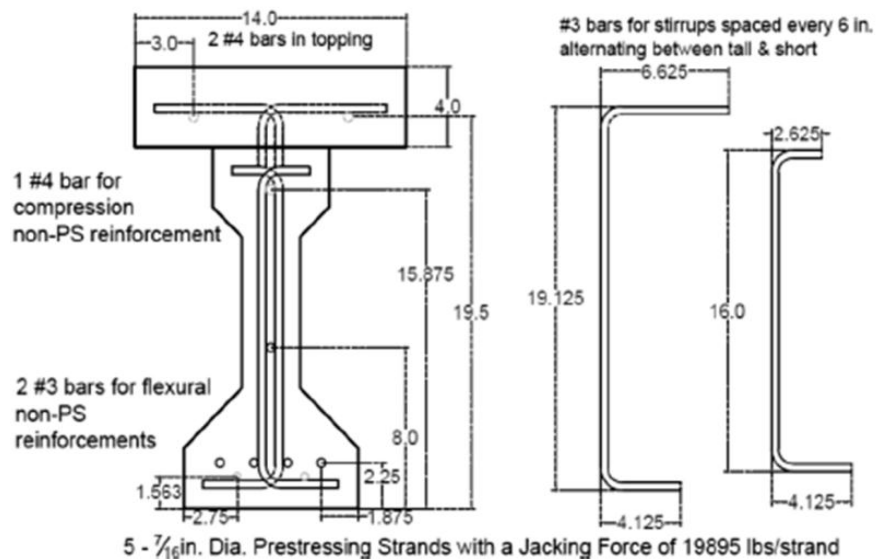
Prestressed Girder Cross-Section (EISafty & Graeff, 2012)
